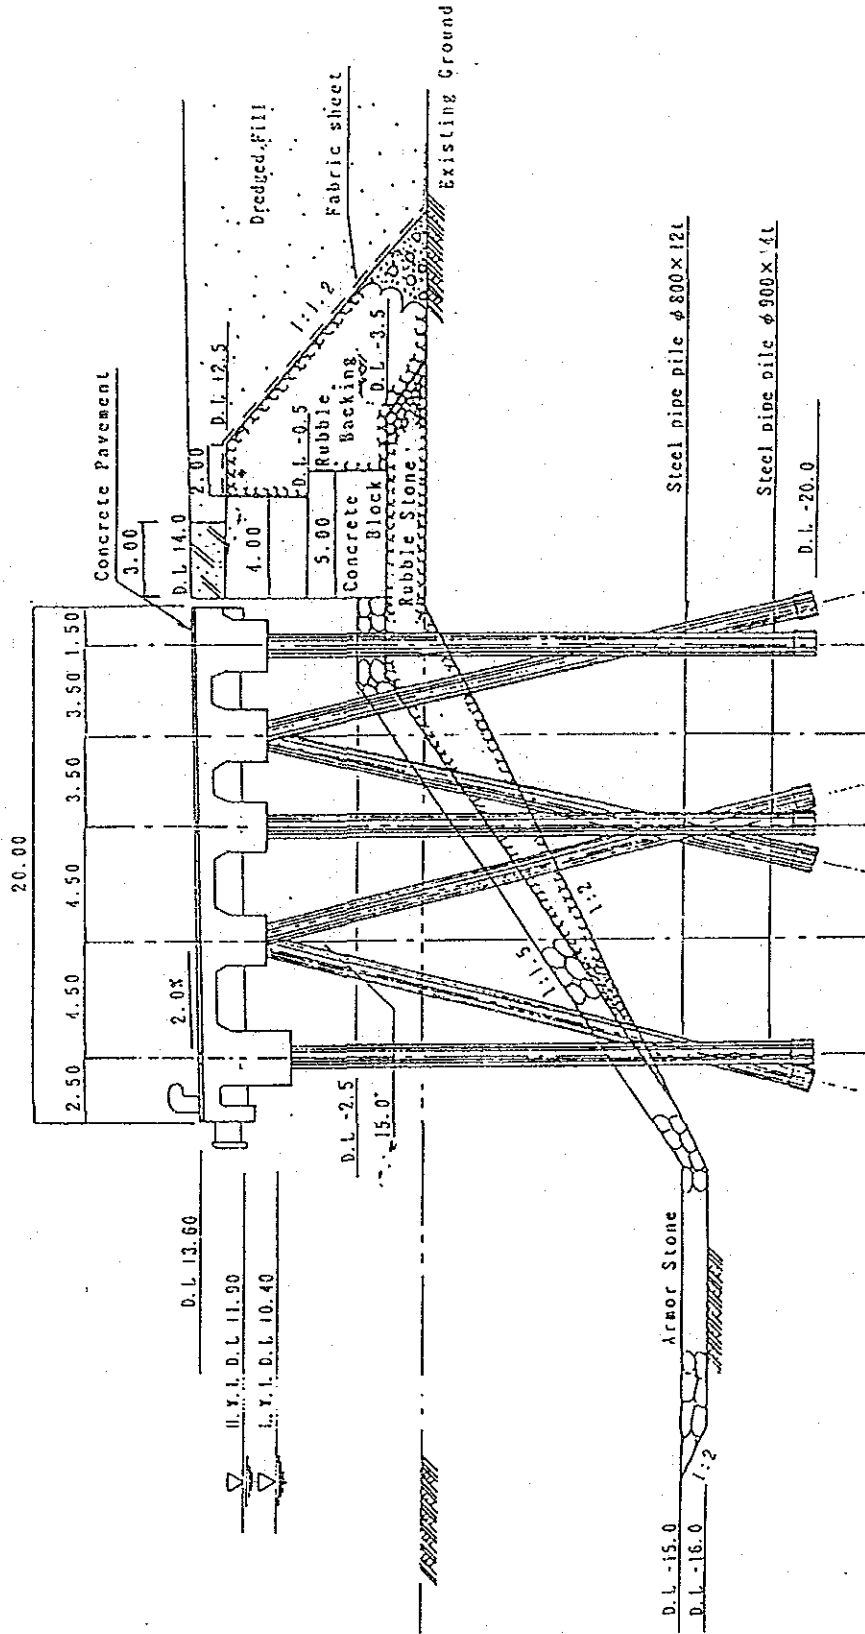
Open Type of Steel Pipe Pile for Grain Quaywall
